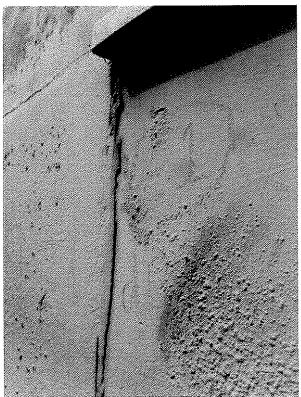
View showing a misaligned panel by 5mm to the front elevation which were typical throughout the structure.
